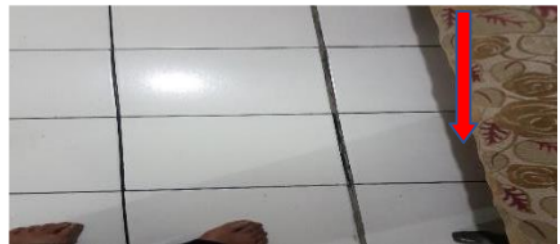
Slide floor of 1st resident's house (Source: Author document)
